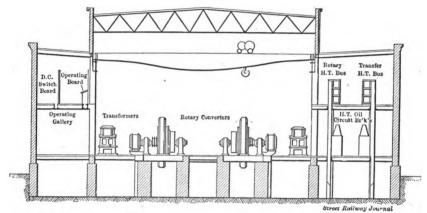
TYPICAL SUB-STATION, LONG ISLAND RAILROAD.
